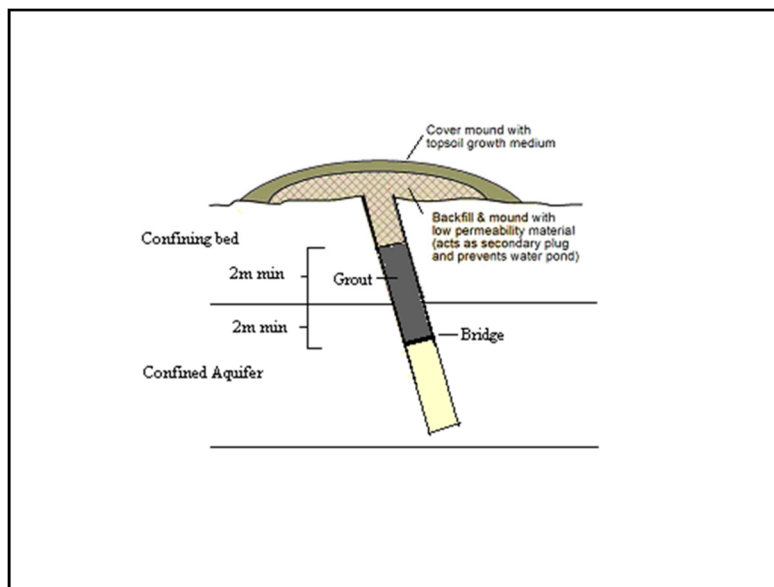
Capping and plugging of drill holes intersecting a single confined aquifer
